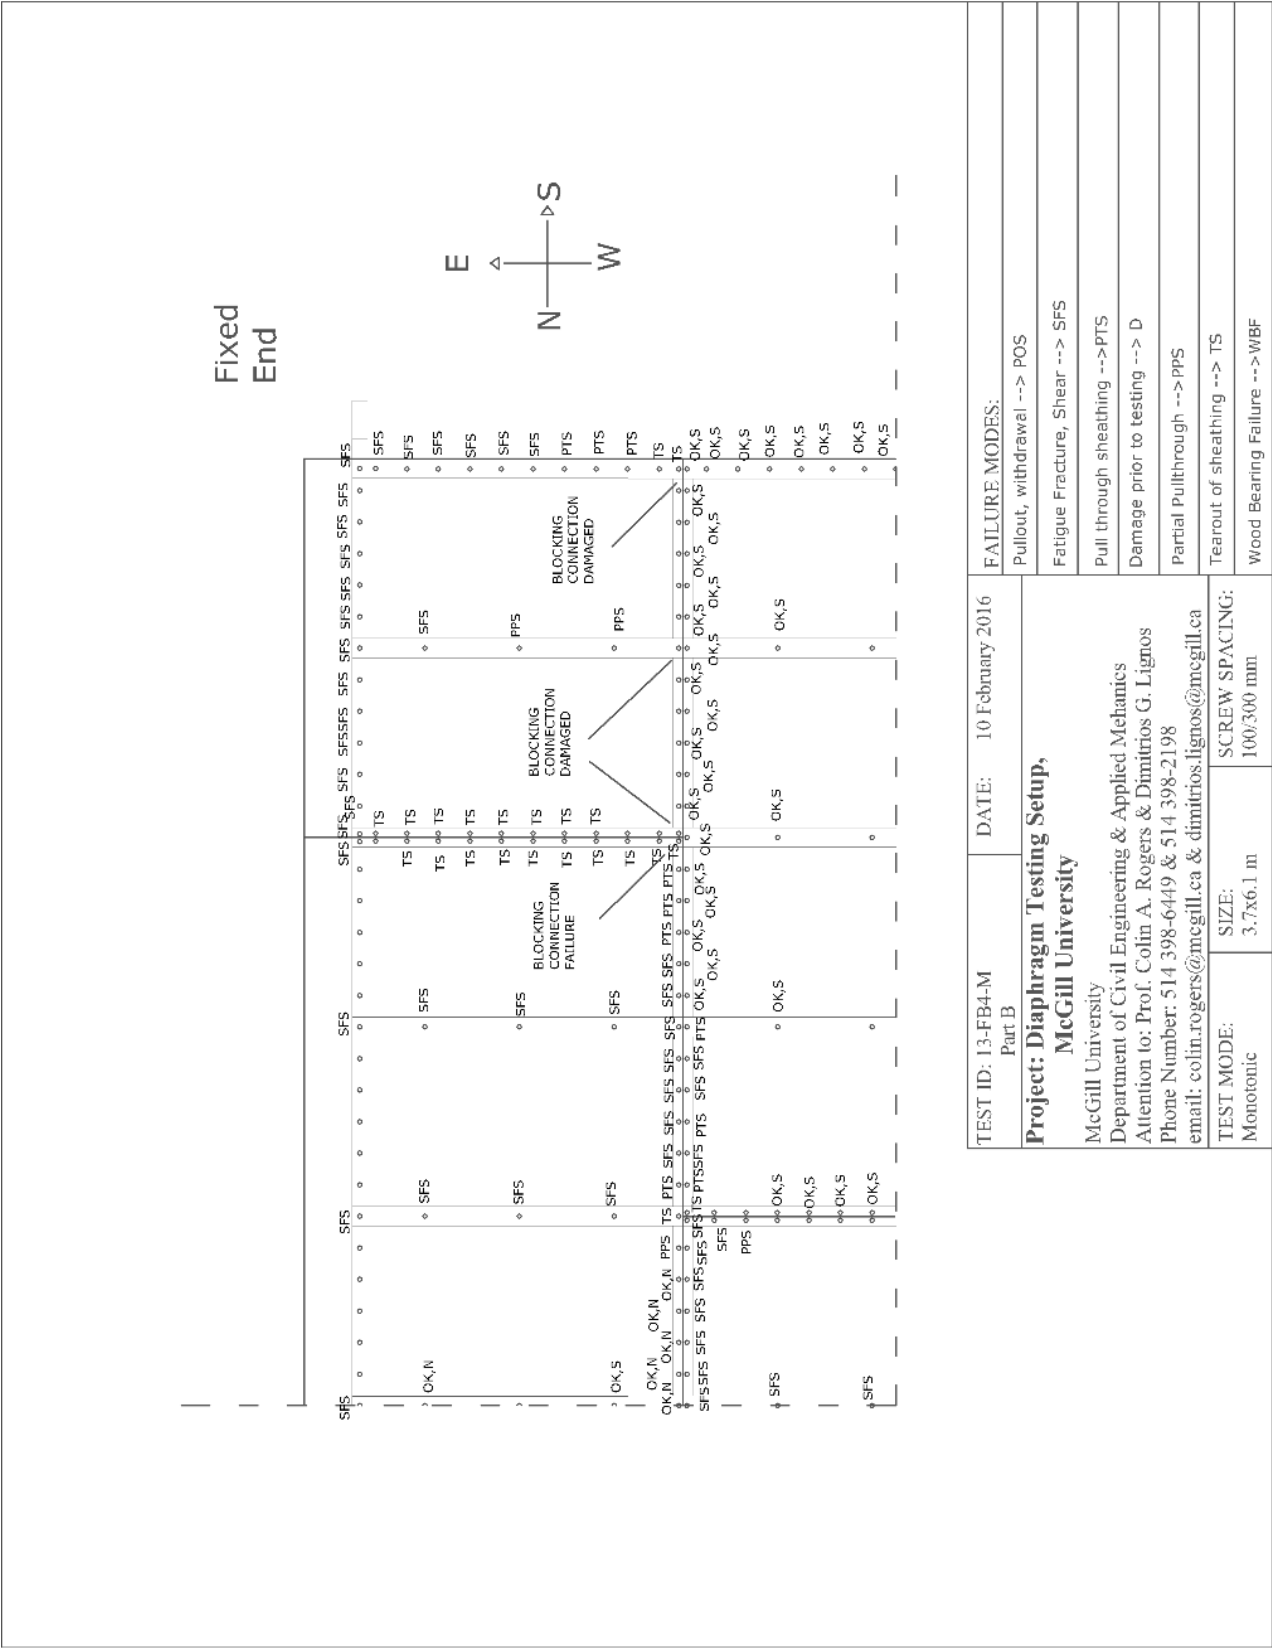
Sheathing Fastener Failure Modes Part B Specimen 13-FB4-M
